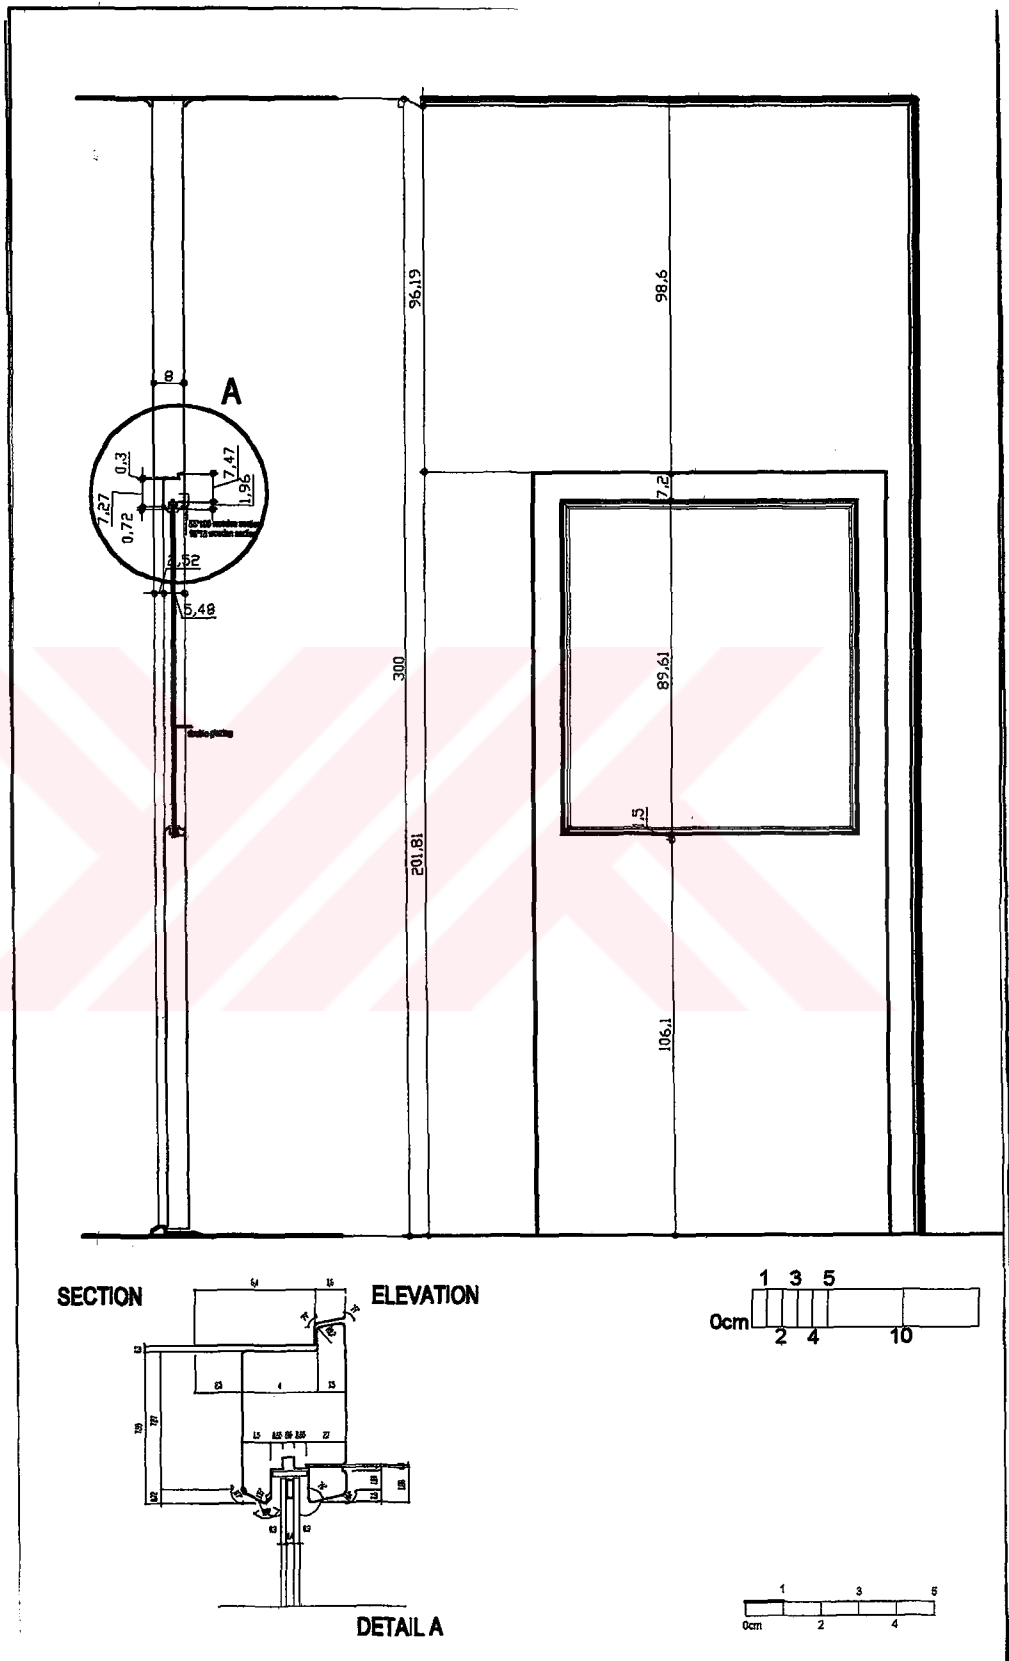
Windbreak (Addition Door) Section, Elevation and Detail
